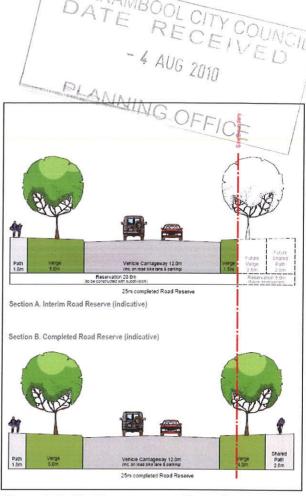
Indicative cross sections of Gateway Road extension and Boiling Down Road
